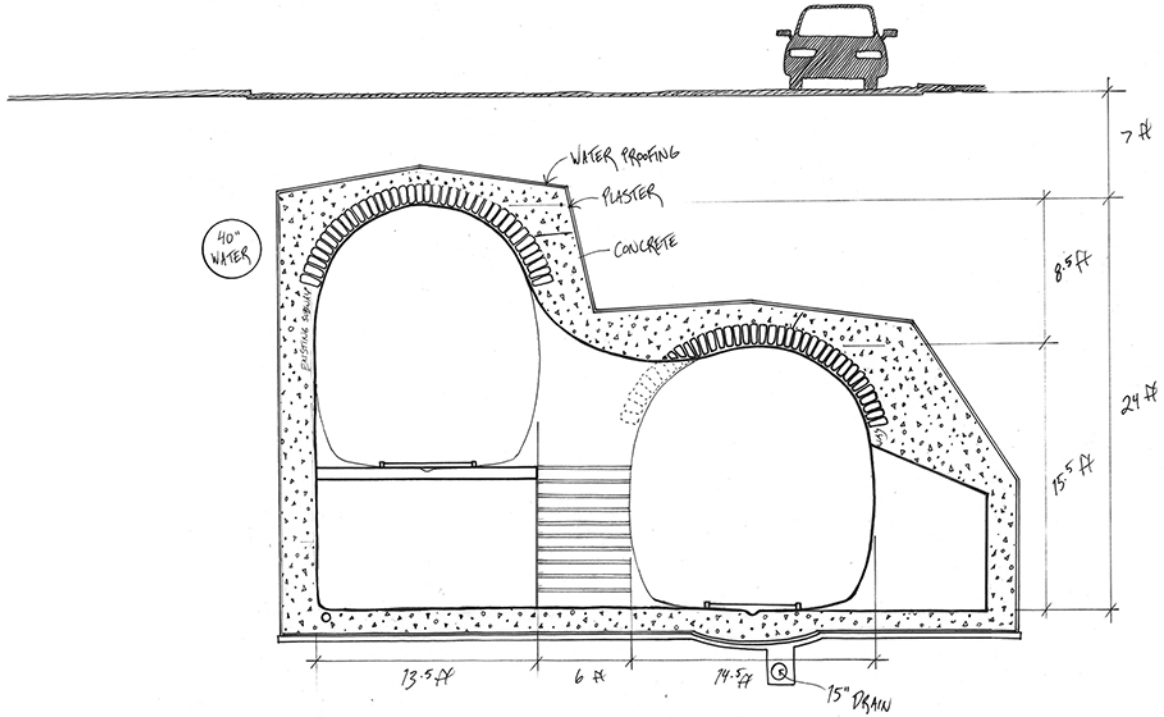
CROSS SECTION ABOUT 17 FEET NORTH OF SOUTHERLY LINE OF BOYLSTON STREET.
